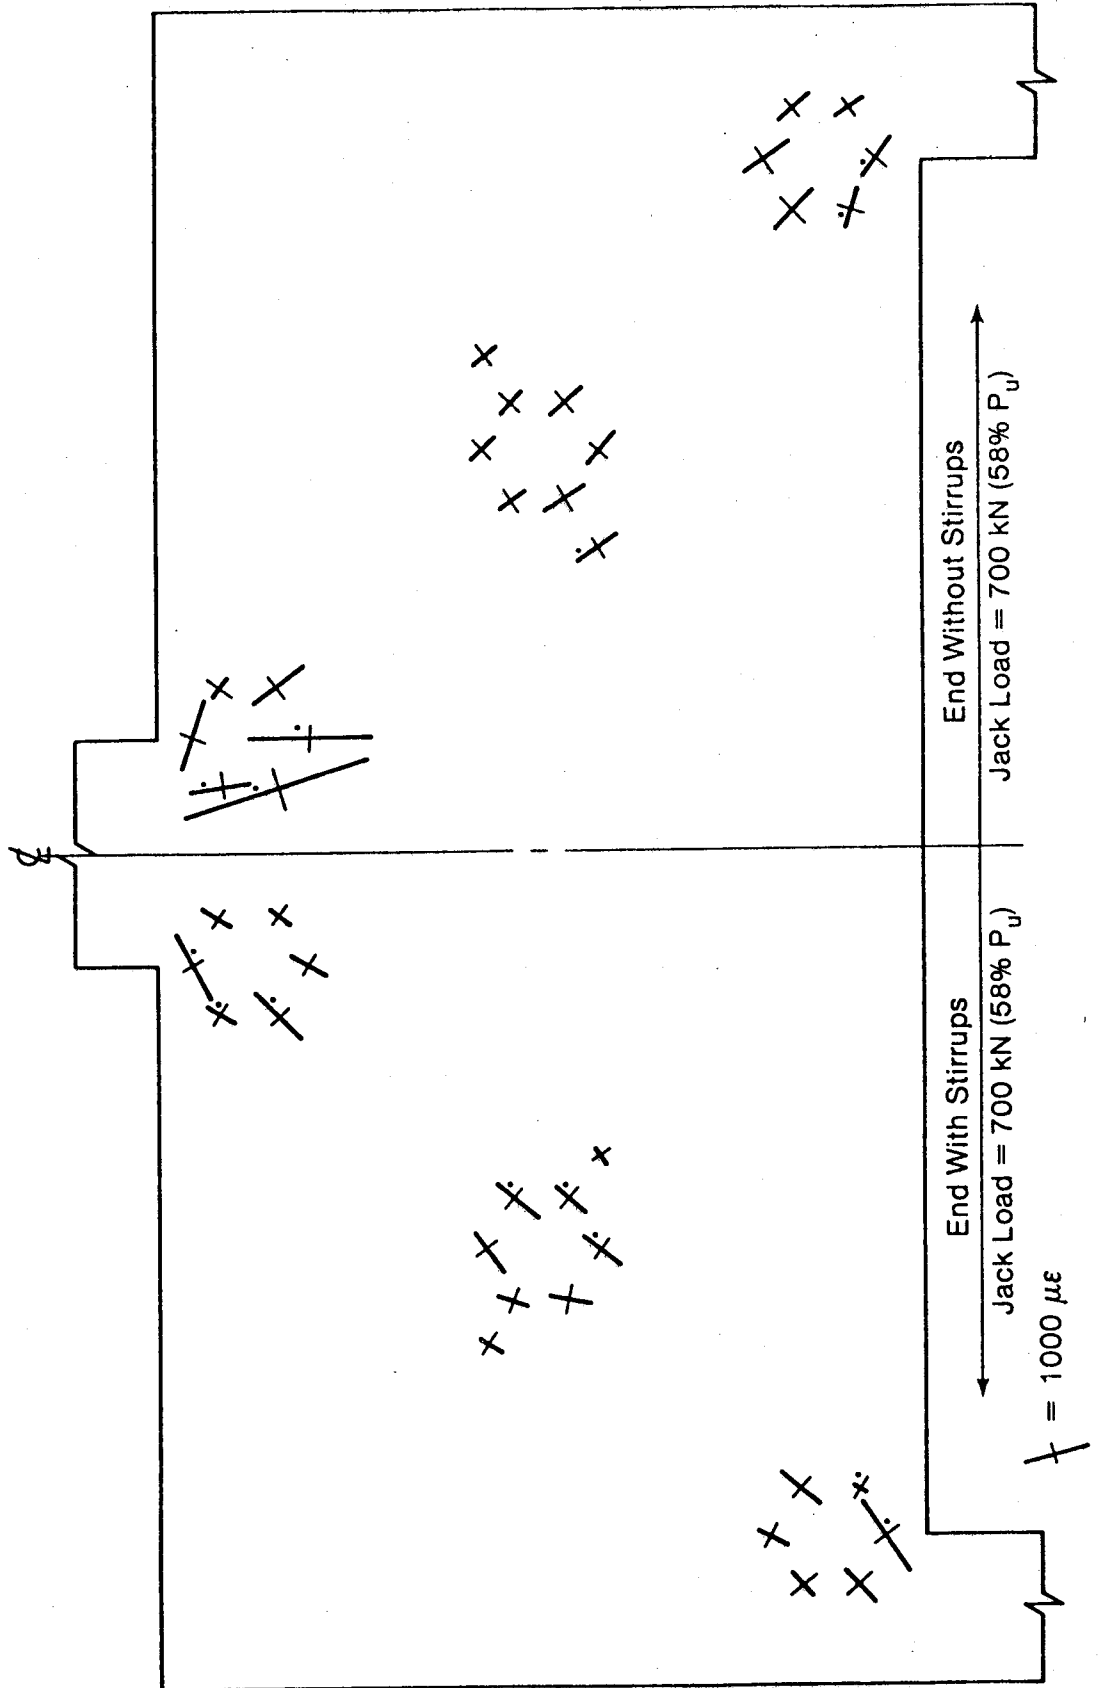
Beam 1/1.0 Concrete Compressive Strains
